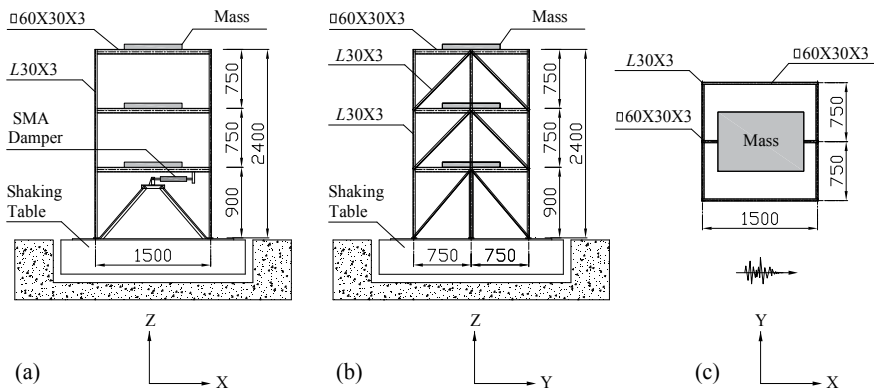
Geometrical characteristics of the steel frame model (unit: mm): (a) X direction elevation; (b) Y direction elevation; and (c) typical floor plan.
